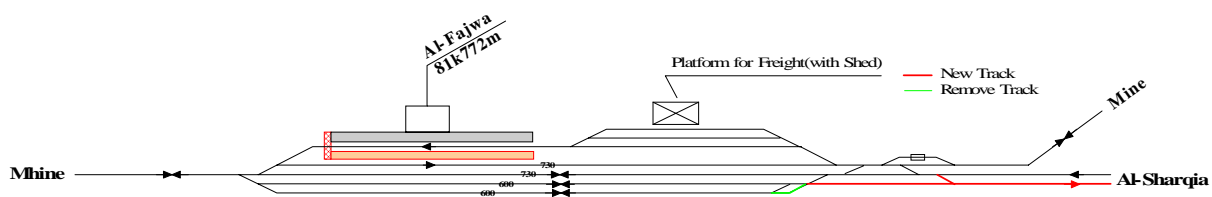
Sketch of Al-Fajwa station improvement track layout
